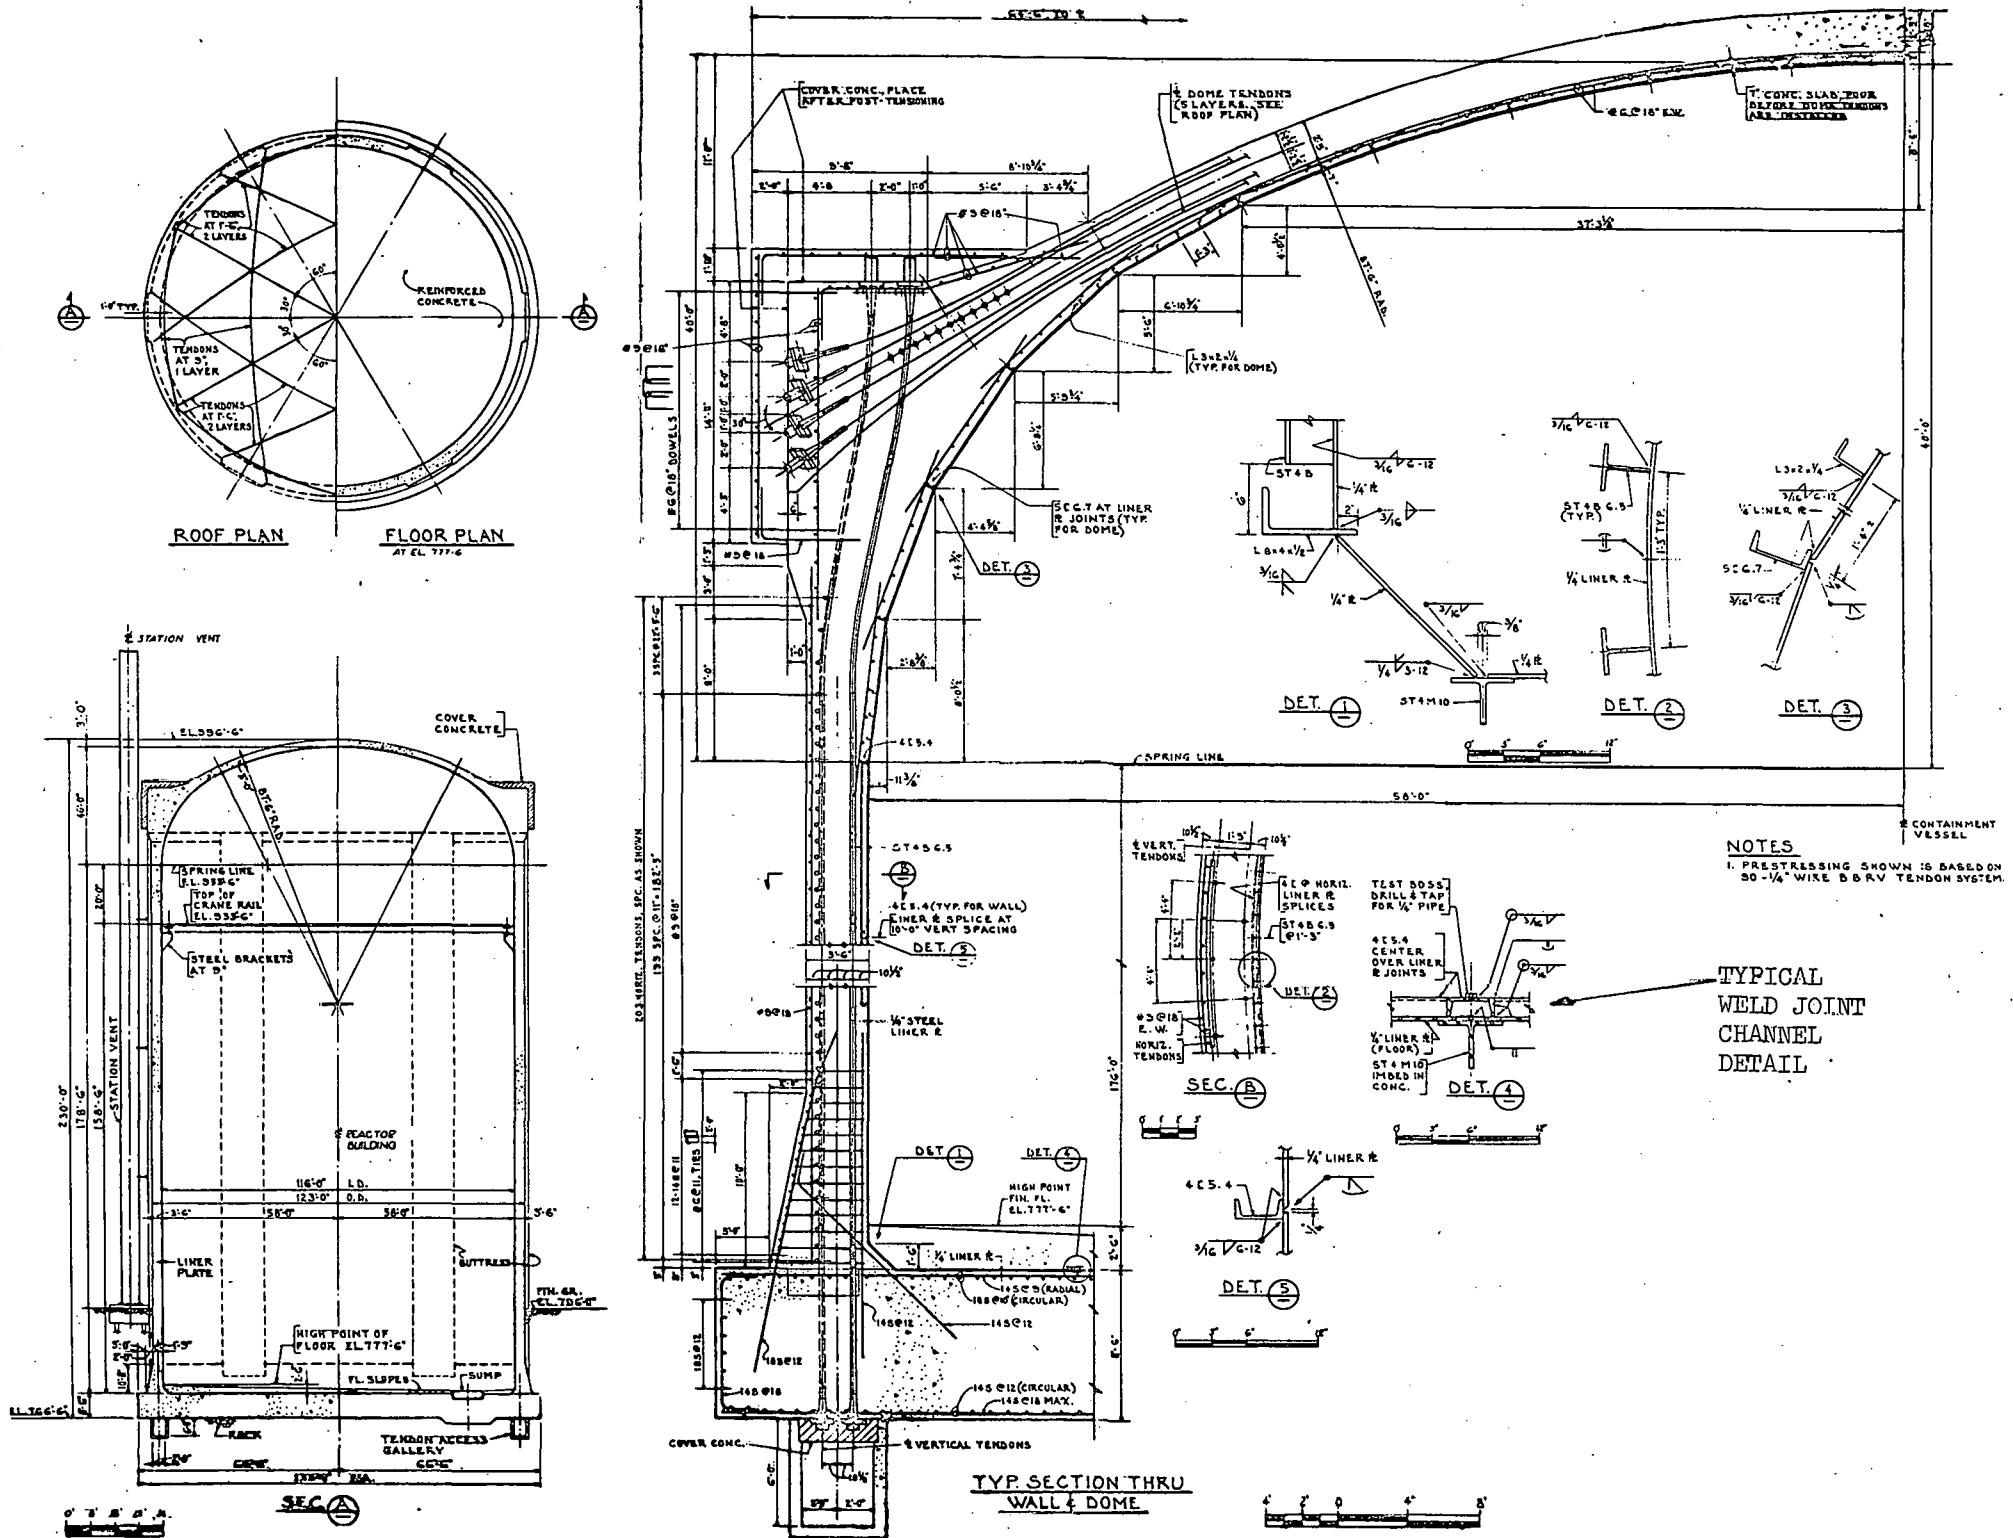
Typical Prestressed-Reinforced-Concrete Containment Structure. (From Ref. 36)
